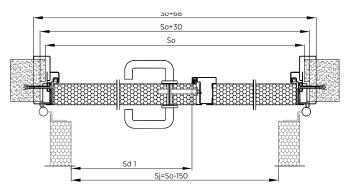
Installation of a double-leaf door to a masonry wall – wrap-around frame with a thermal break – horizontal cross-section
